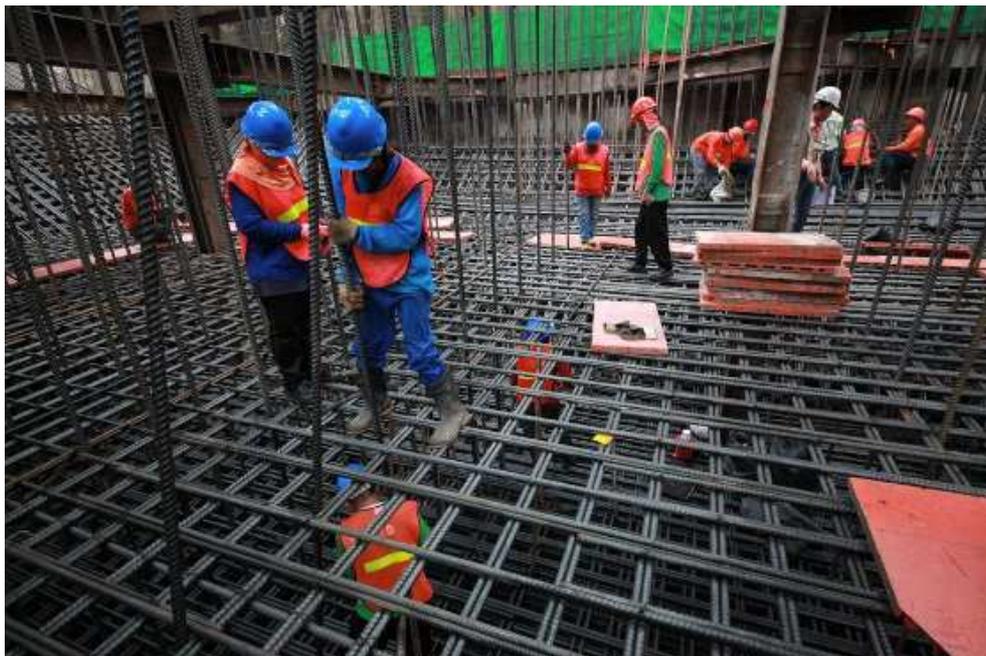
Reinforcement work of MahaNakhon mat foundation. (Source image courtesy of PACE Development PLC)
